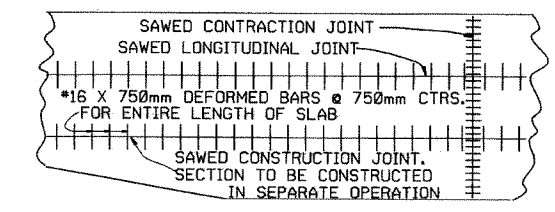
DETAIL OF SAWED LONGITUDINAL JOINT AND LONGITUDINAL CONSTRUCTION JOINT
